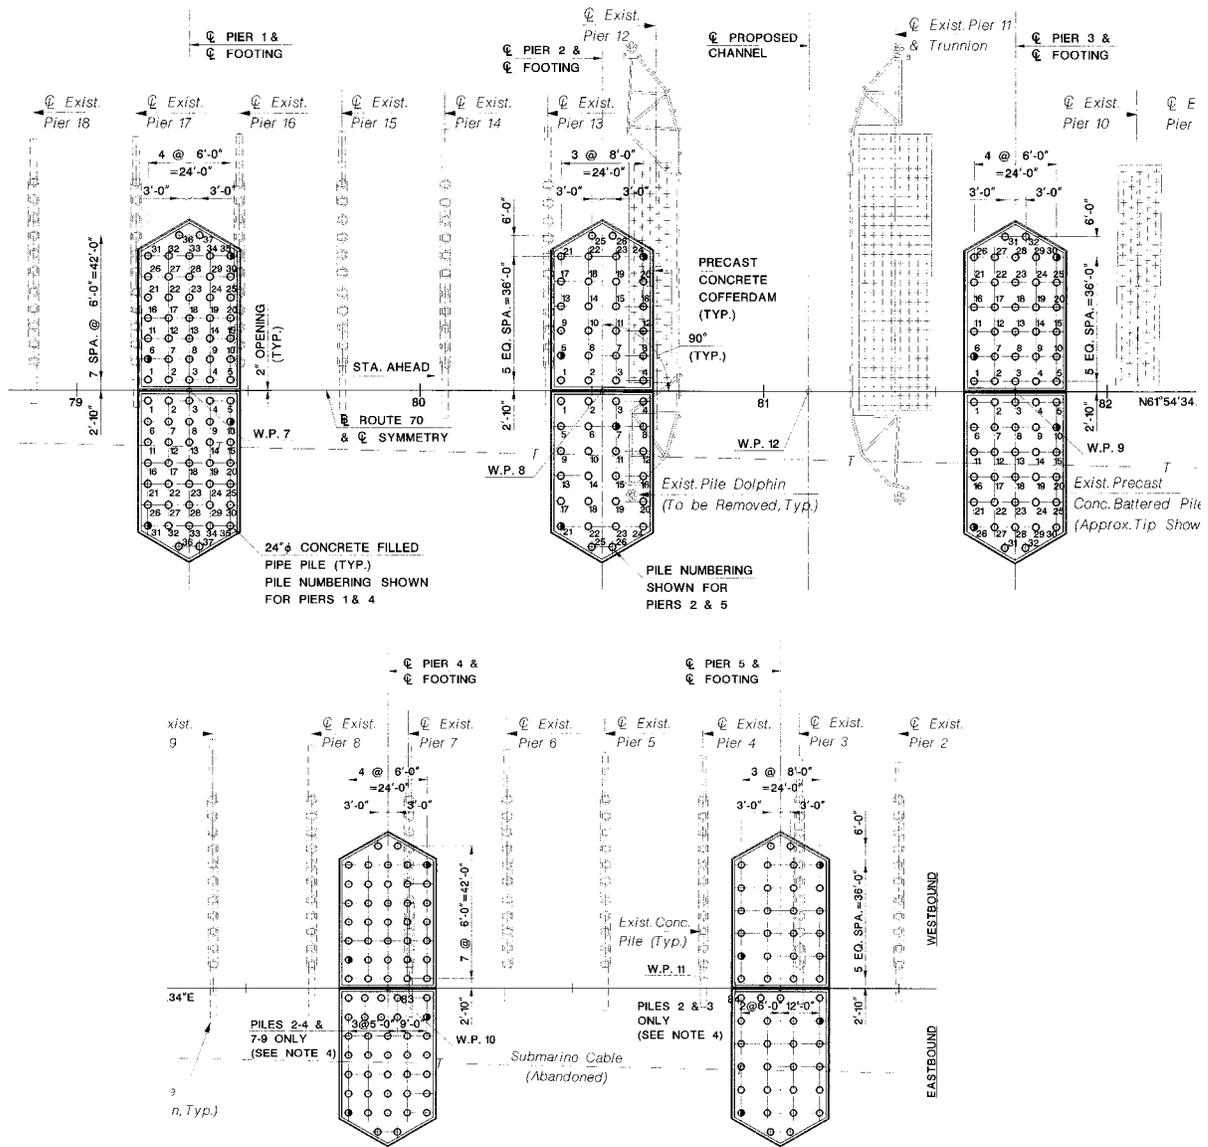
Footing Layout for Piers 1,2,3,4,5
